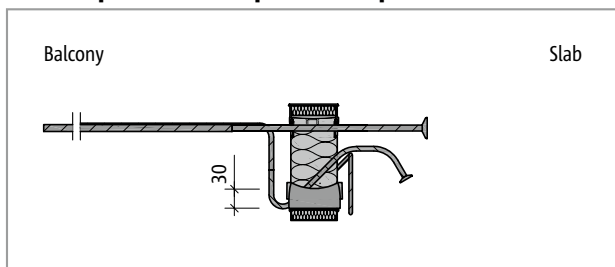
Schöck Isokorb® T type K-U-M4: Cross section of the product
